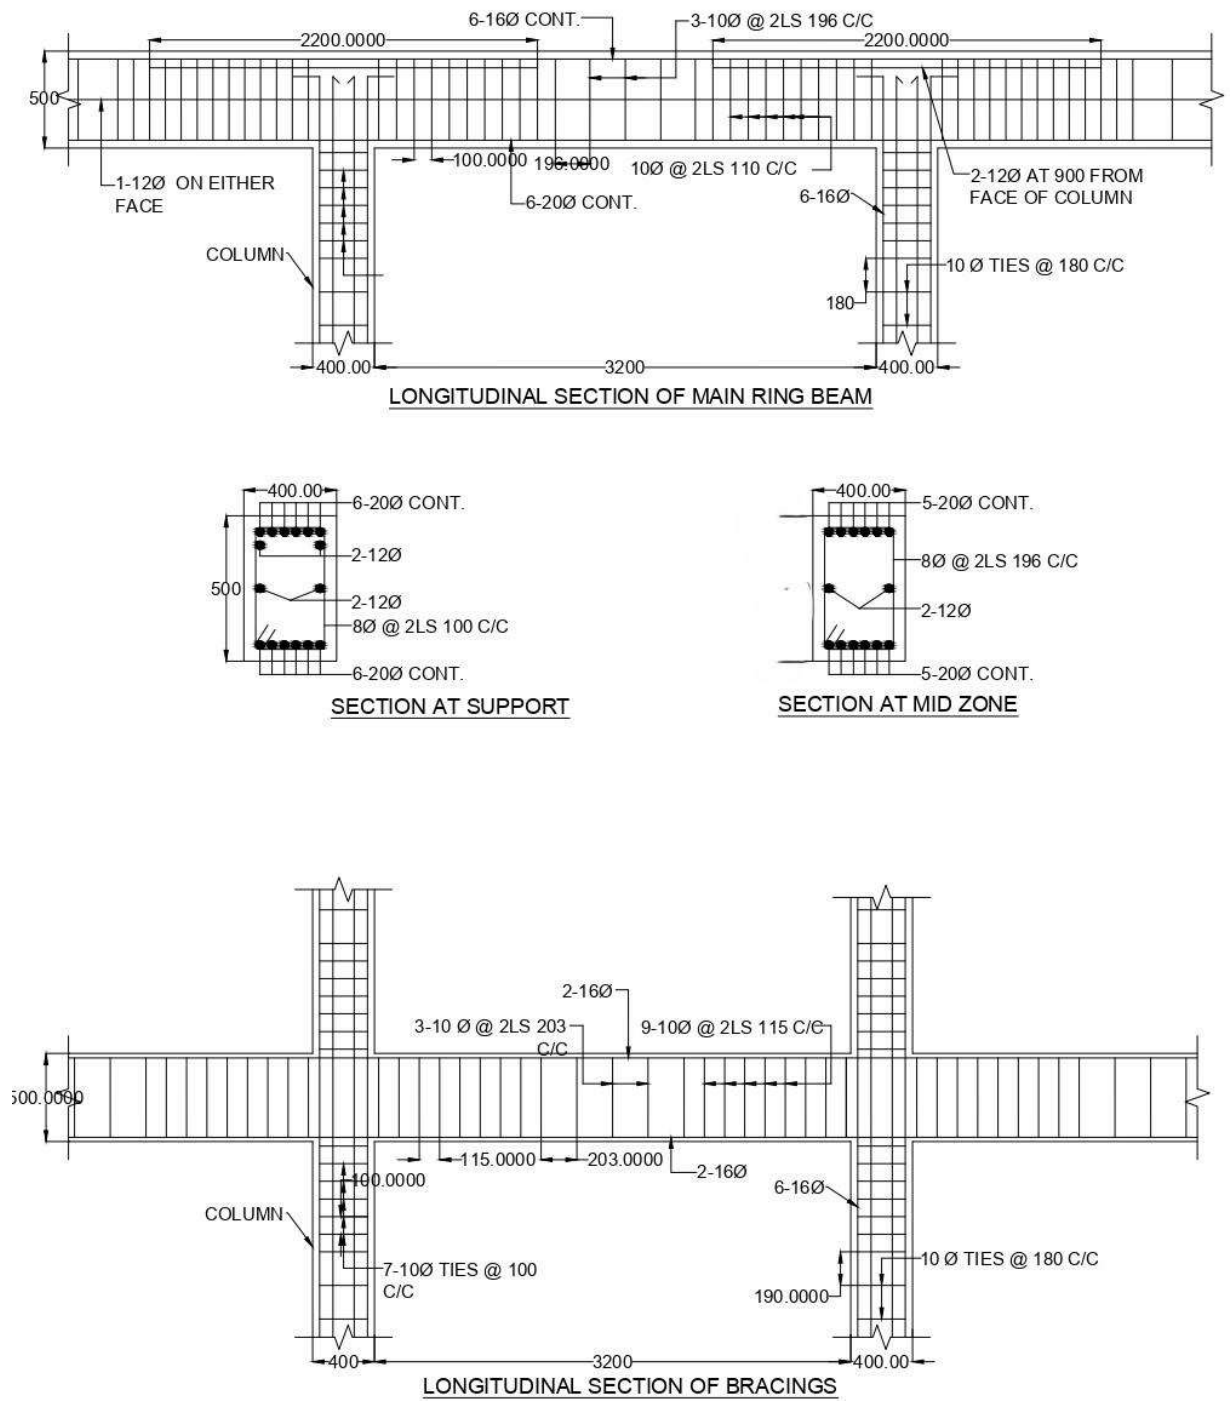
Reinforcement plan of main ring beam and bracings of hybrid Circular tank
